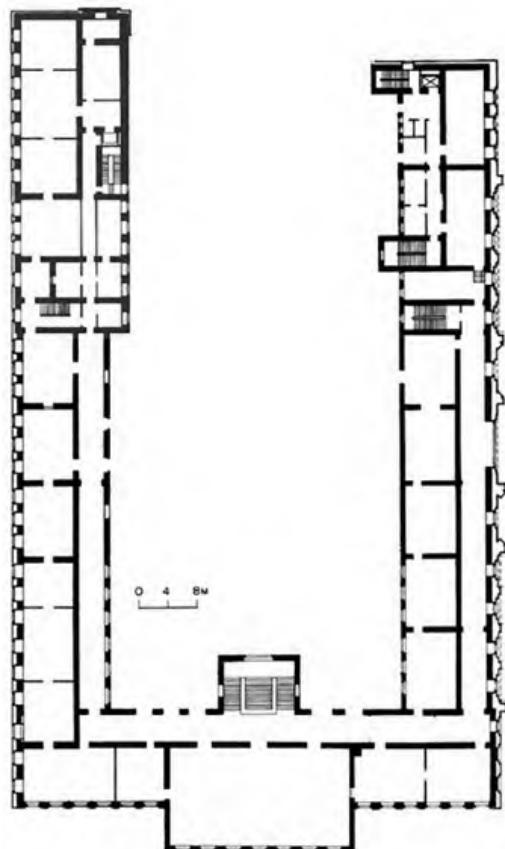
Plan of the second floor of the Boy's Classical Gymnasium on Abovyan street, Yerevan, 1916-1920. Geometrical survey
